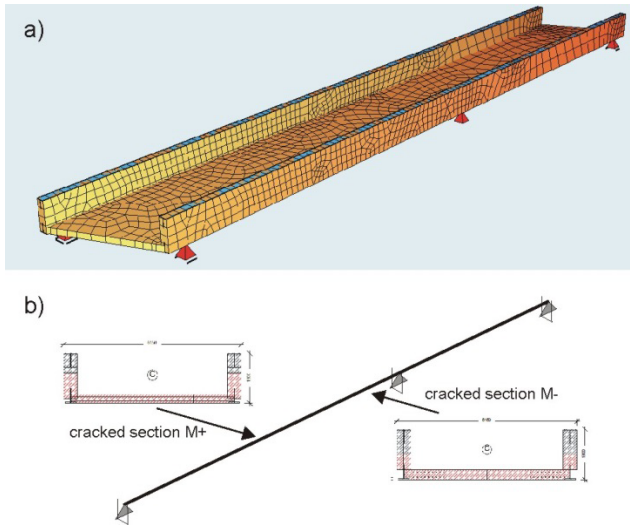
FEM models of the bridge structure made by external consulting [10]: a) mixed shell + beam model with shell elements standing for concrete parts and beam elements standing for structural steel parts; b) beam model using cracked steel–concrete sections.
